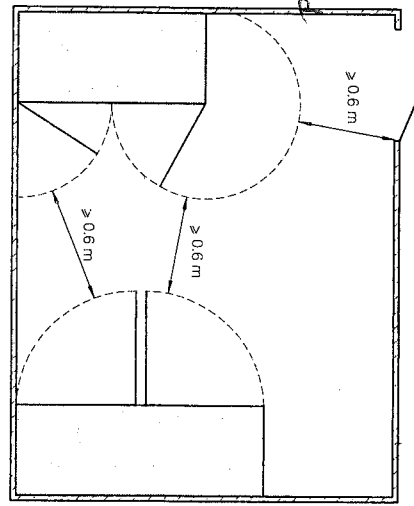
ACCESS TO SWITCHBOARDS—FACING SWITCHBOARDS
